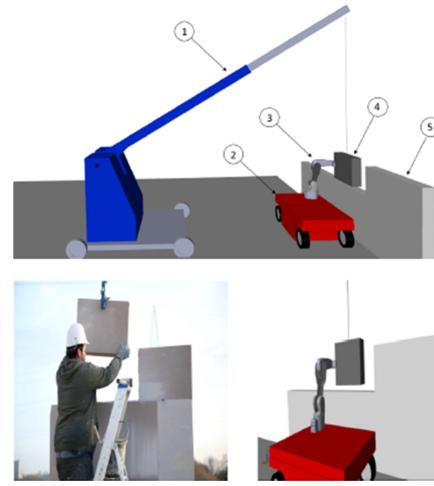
Layout of the robotic solution. (1) is the crane, (2) the aerial work platform, (3) is the robotic arm, (4) is the heavy construction element, and (5) is the existing wall.
